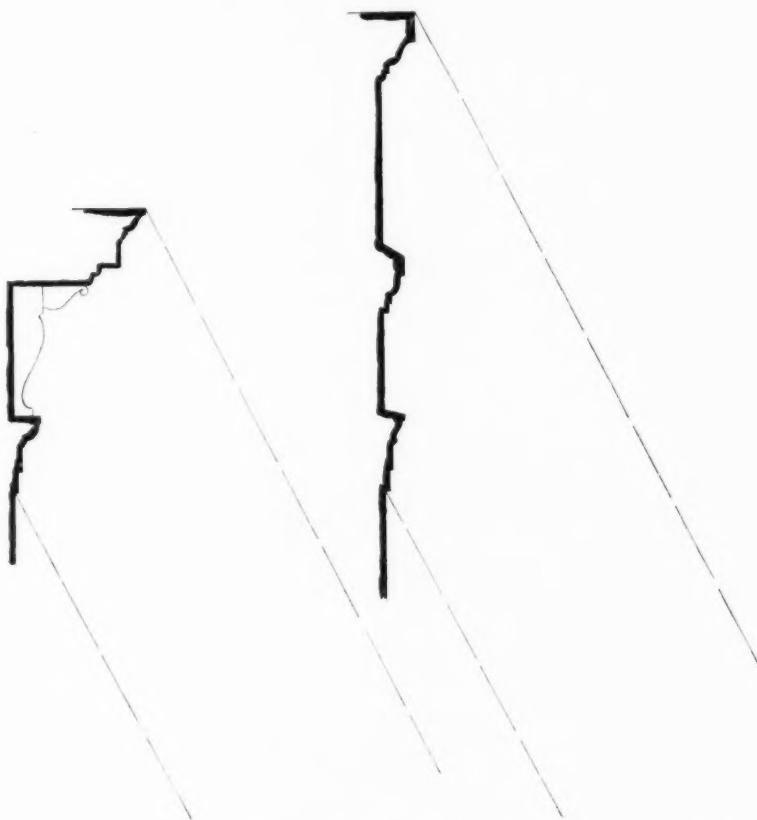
A Vertical Cornice-Member, 14 Feet High, Subtending the Same Angle as a Wall Cornice, 9 Feet High and of 4 Feet Projection.
